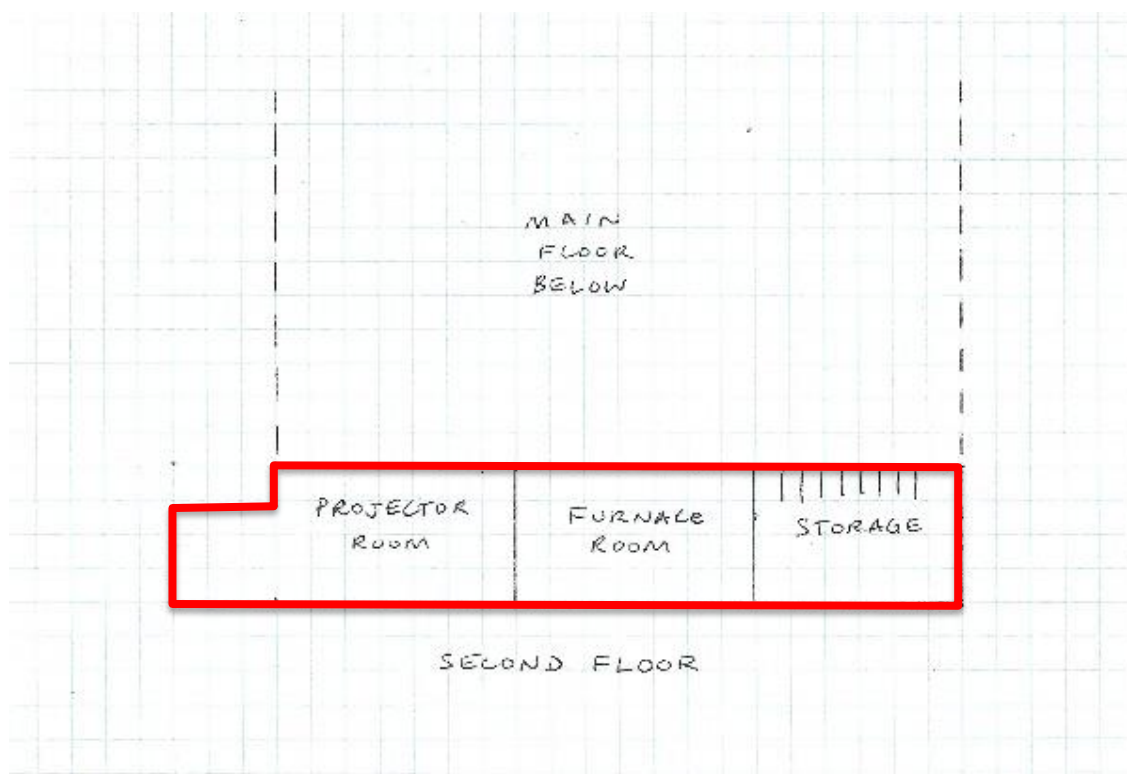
Plan of the second floor of Red Barn Arts Centre. Red outline indicates original extent of building (1926). Note: not to scale. Adapted from sketch plan provided by Joy Neish, Eagle Valley Arts Council.
